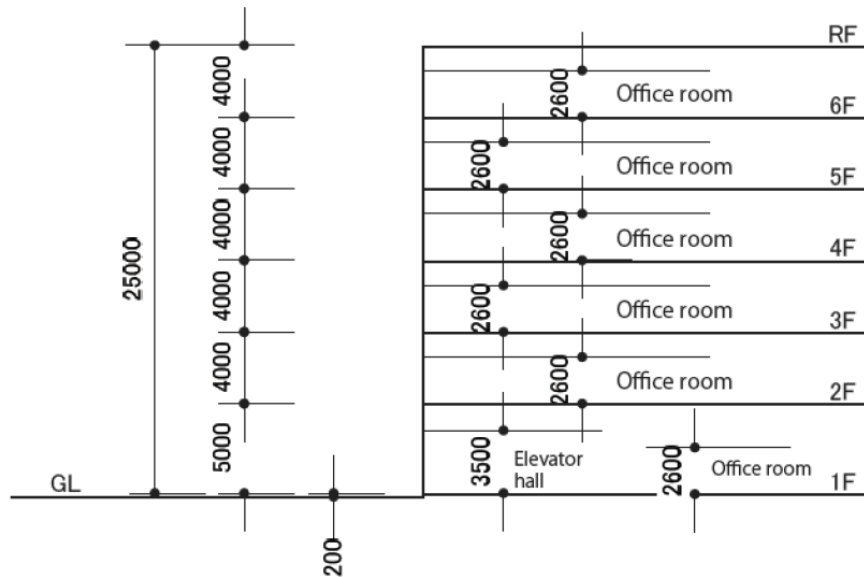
Second case study layout of building – Section - ISO 18523-1-2016
